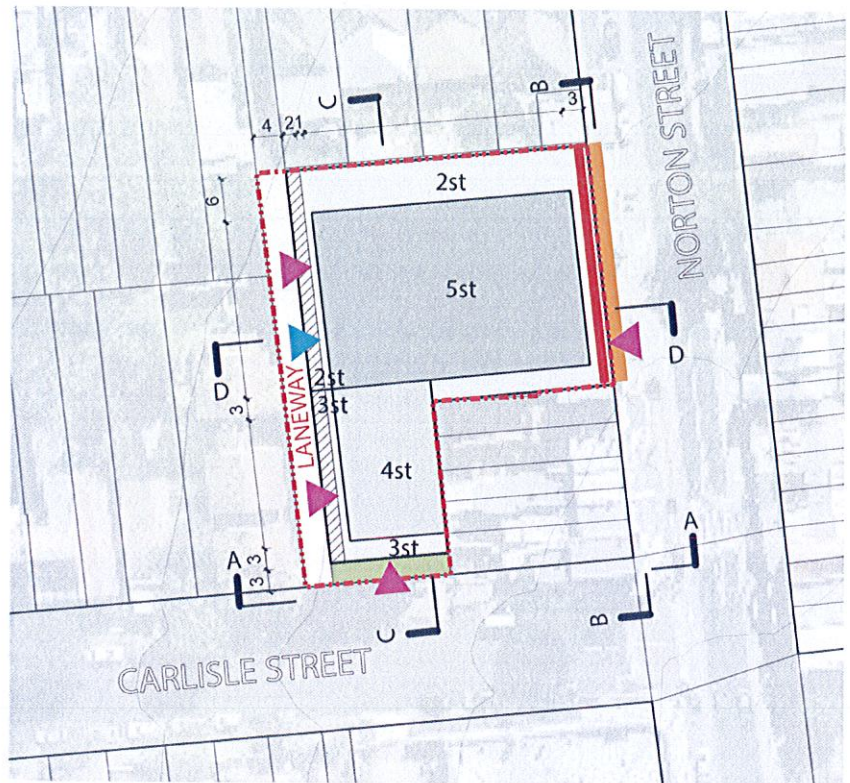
Norton Street and Carlisle Street _ Building envelope plan
